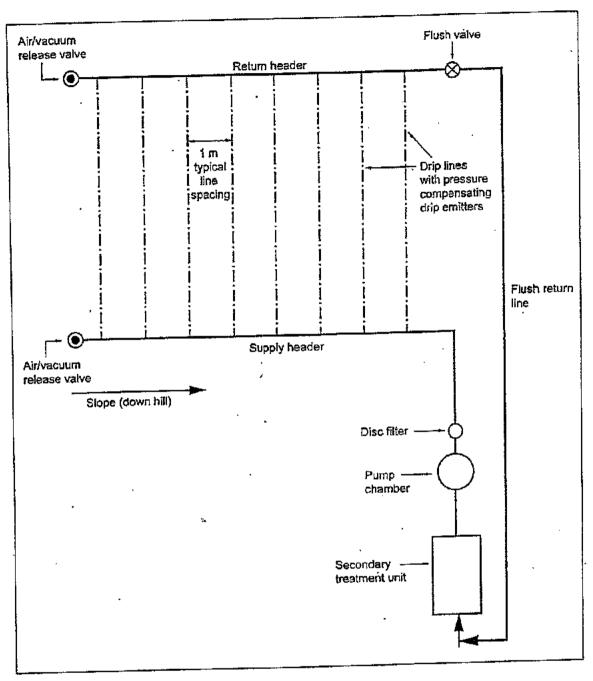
DRIP IRRIGATION SYSTEM - EXAMPLE LAYOUT OF COMPONENTS
